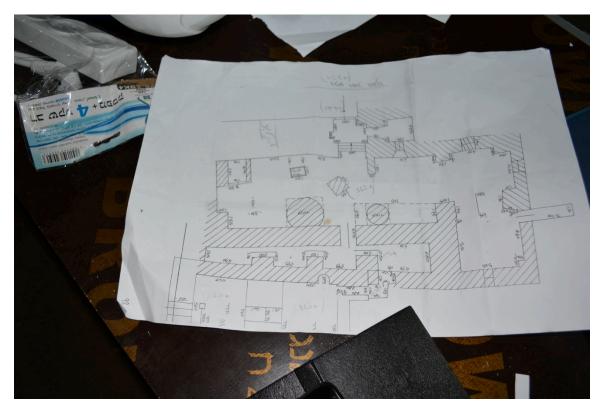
Initial architectural plan of the vault of St. Andrew's Church
